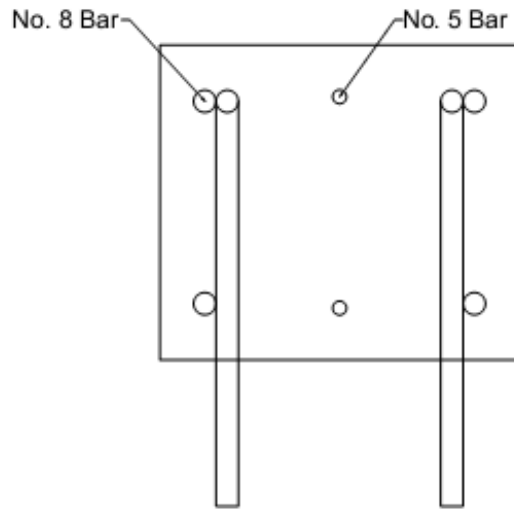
Longitudinal column reinforcement-6 No. 5 bars. Transverse reinforcement not shown.
